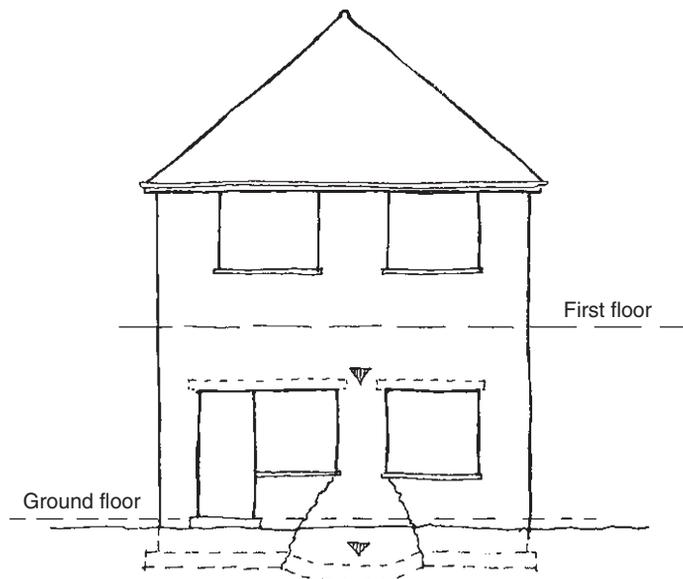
Example of overloading. Settlement in the centre of a wall with ends stable. Heavy loads from first floor, roofs and walls above are transferred to a narrow pier of brickwork causing cracks in the wall and foundation settlement. With this type of settlement cracks decrease in width with height
